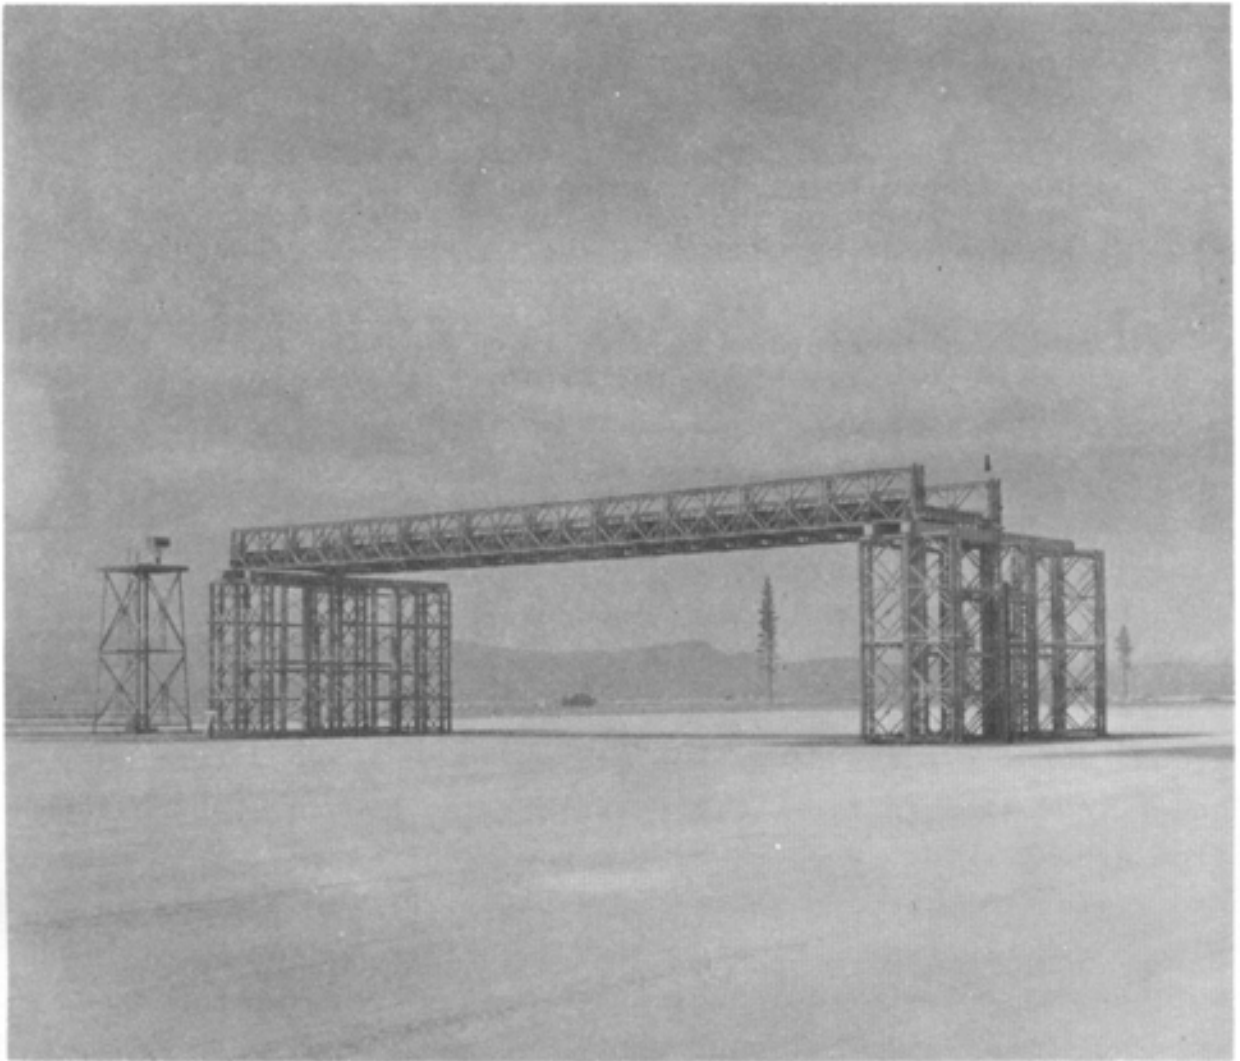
BAILEY BRIDGE CONSTRUCTED FOR PROJECT 3.22 AT SHOT ENCORE
